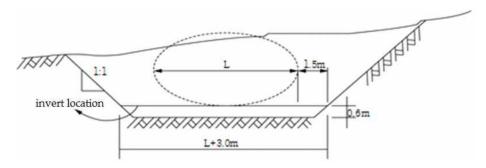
Engineered backfilling section when underground steel plate structure is installed in the banking section
